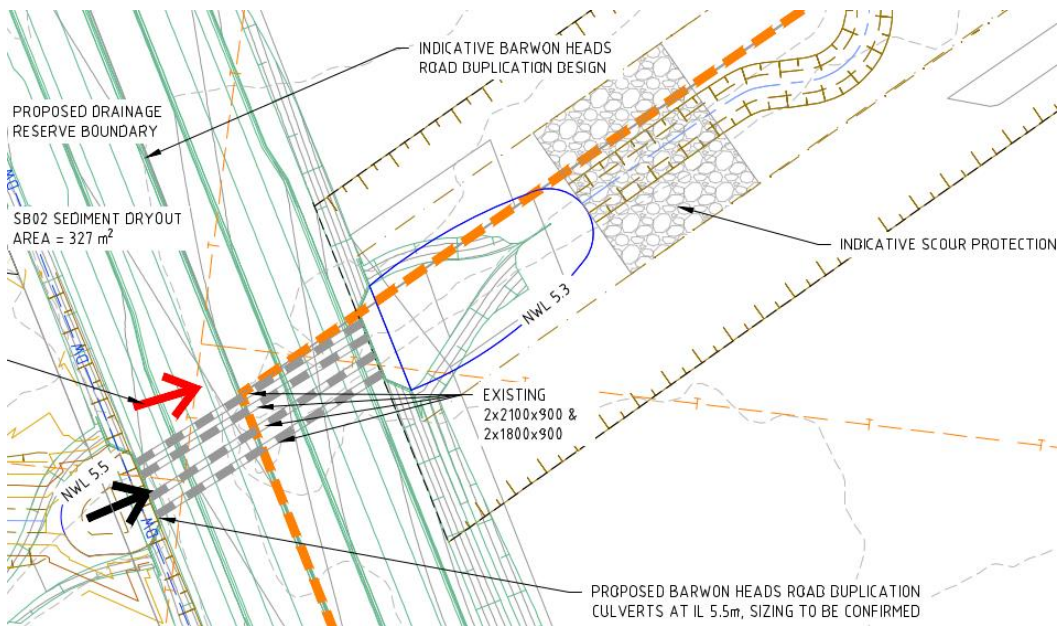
Existing culverts crossing under Barwon Heads Roads – From Spiire concept design plans Appendix 3 of SWMS
